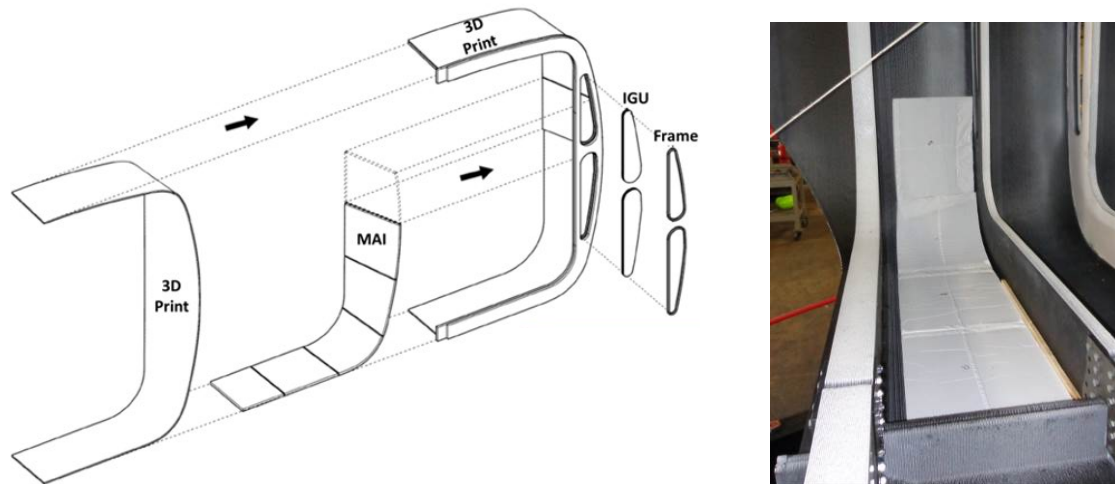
Left: MAI incorporated in AMIE design. Right: MAI inserted into the 3D printed rings during assembly.
